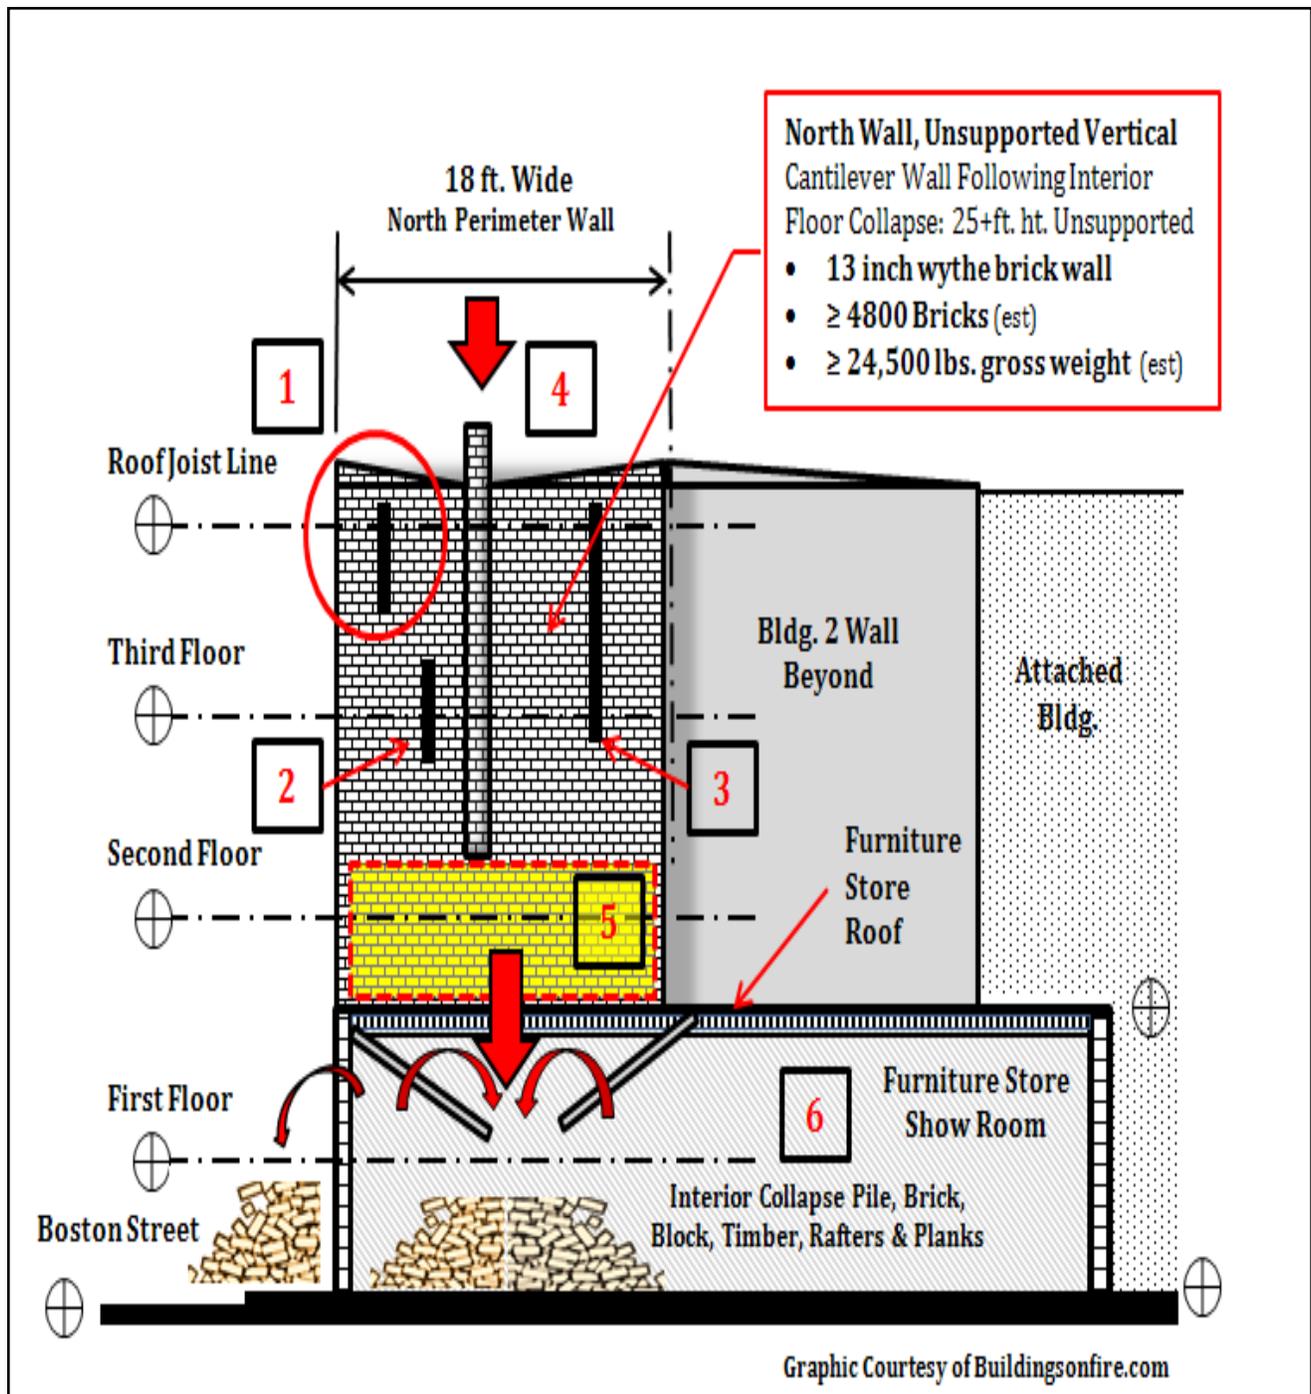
North wall of Building 2 collapse and furniture store sectional view. (Note: for explanation of notes 1-5, refer to page 37. Graphic analysis diagram courtesy of Buildingsonfire.com.)
